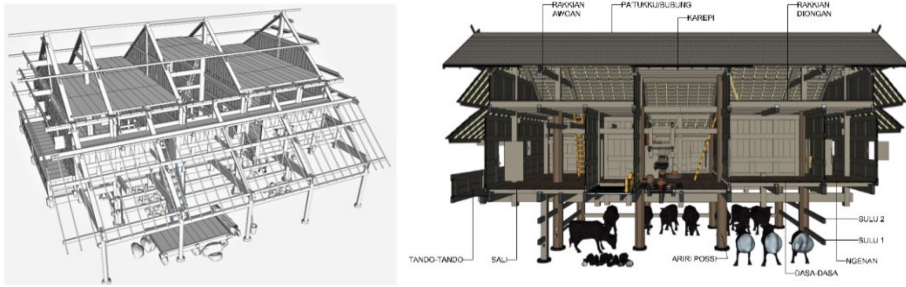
Reconstruction of Banua Katongkoan (Salassa and Jalajja Traditional Houses) (Source: Author, 2021)
